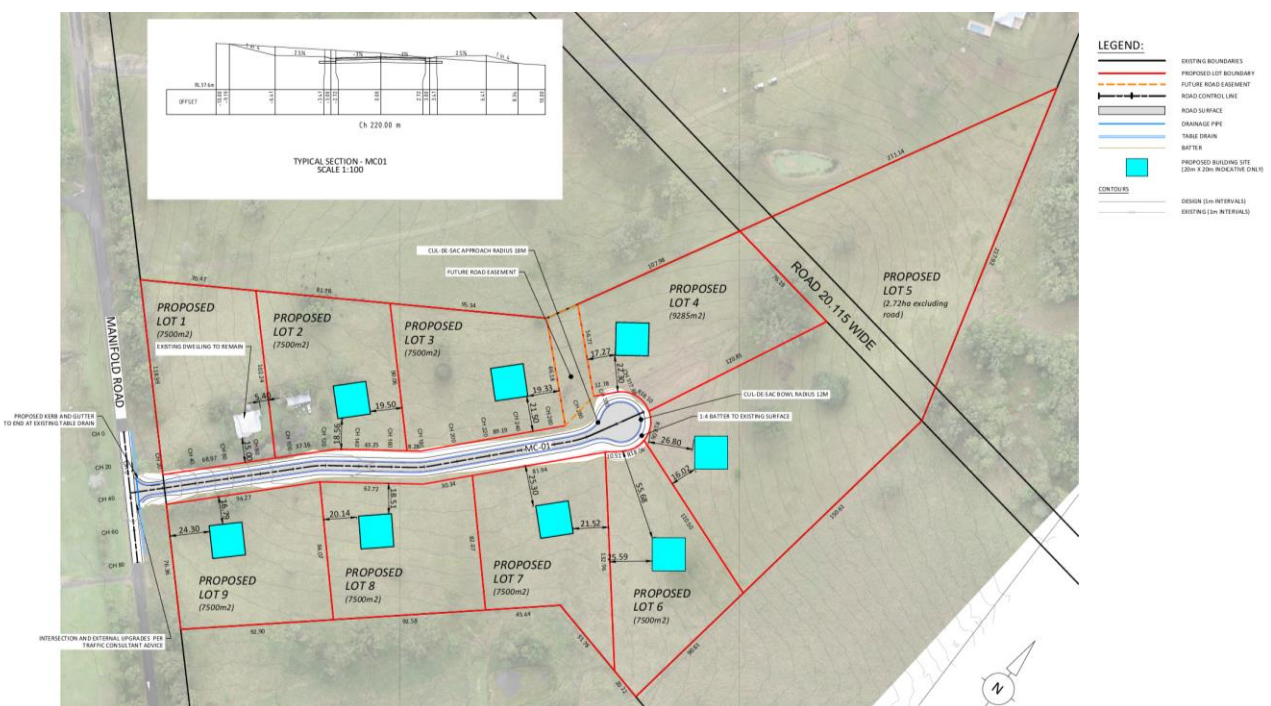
Concept subdivision layout extracted from Planning Proposal PP2025/0001
